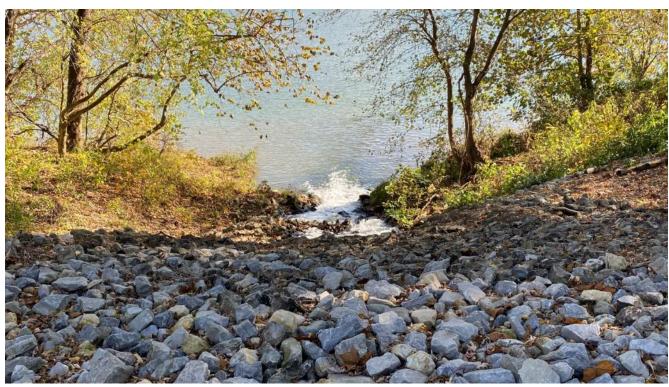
Southern dike embankment downstream side, overgrown section with trail cut in, looking east.
